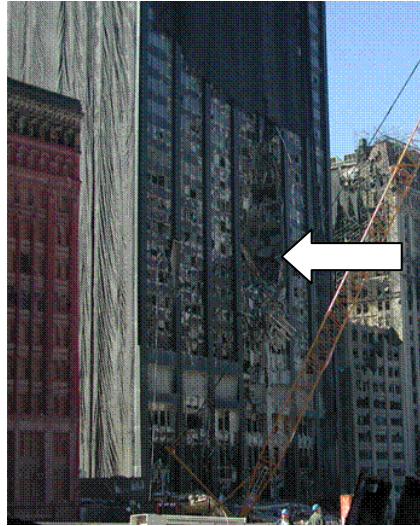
Deutsche Bank Building remains standing despite column loss over multiple stories (see arrow)
